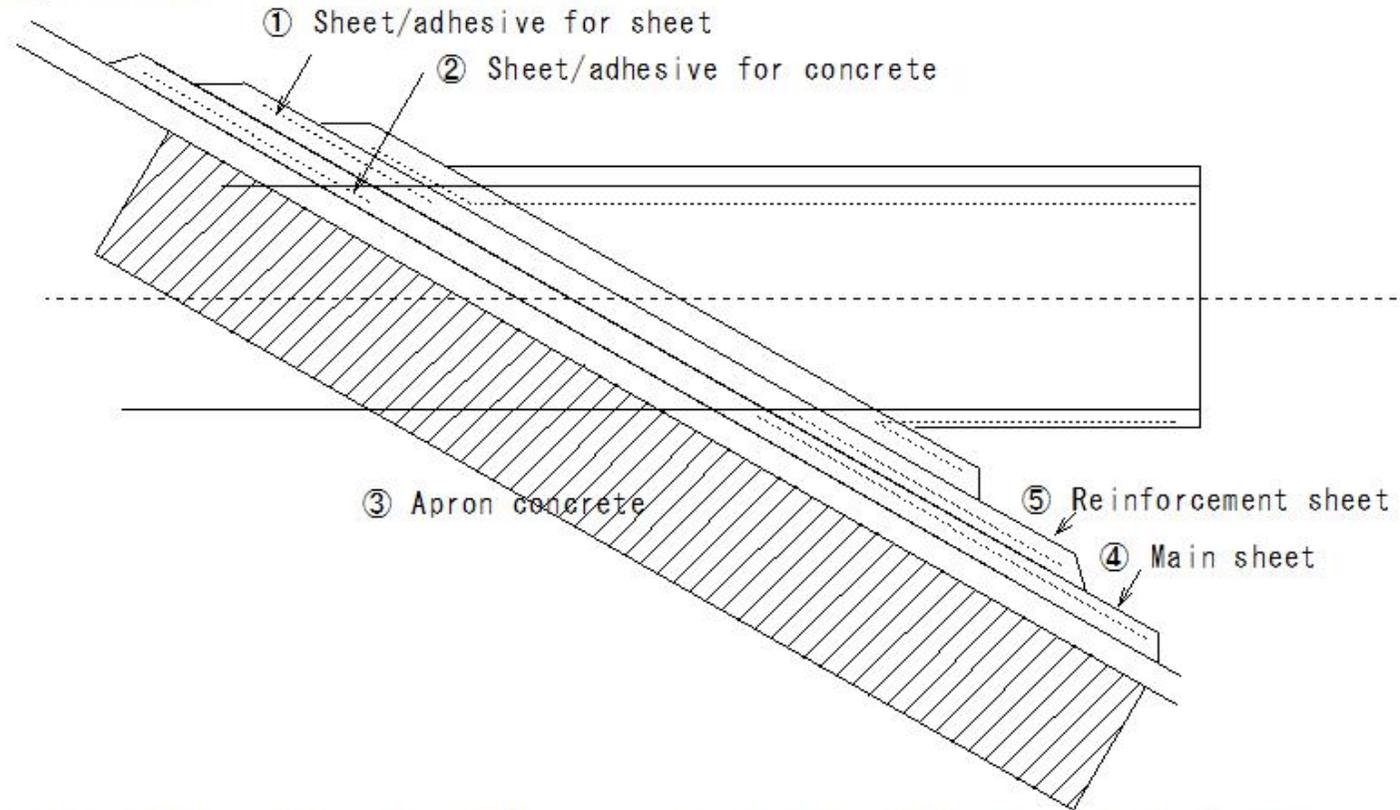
Application for adhesive joining to a concrete structure (around pipes)
